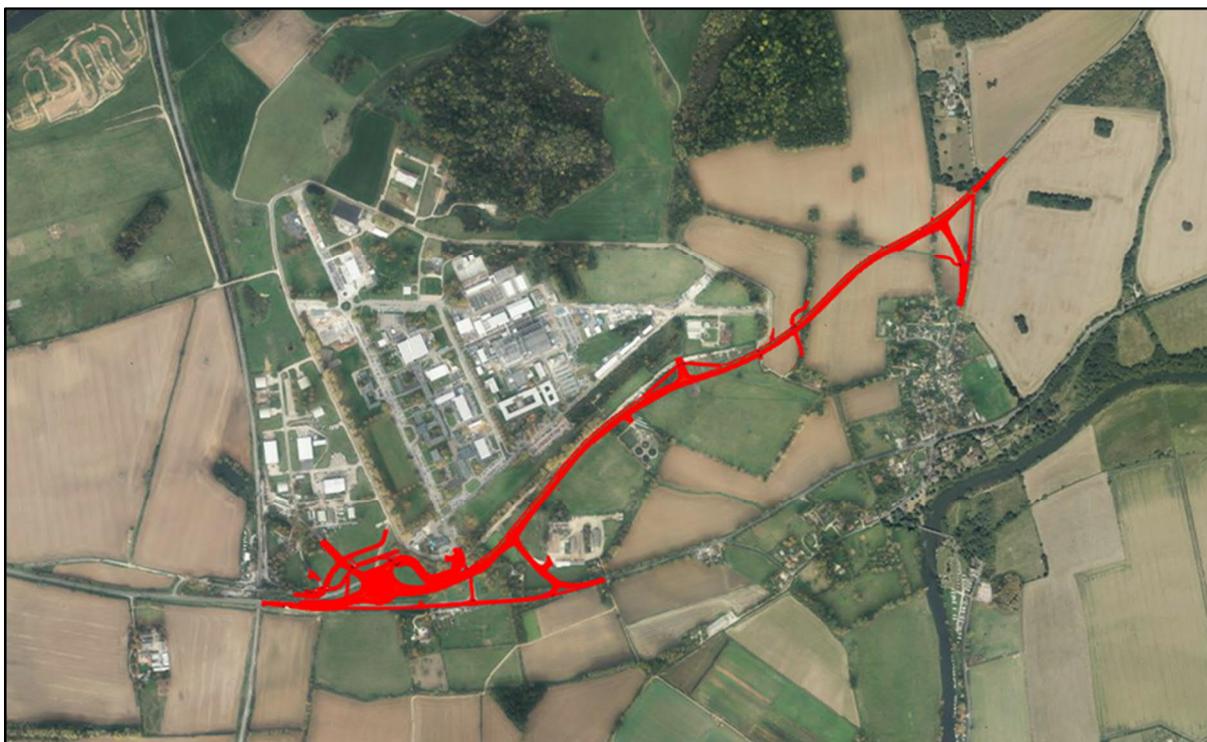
Didcot to Culham River Crossing Layout Plan
